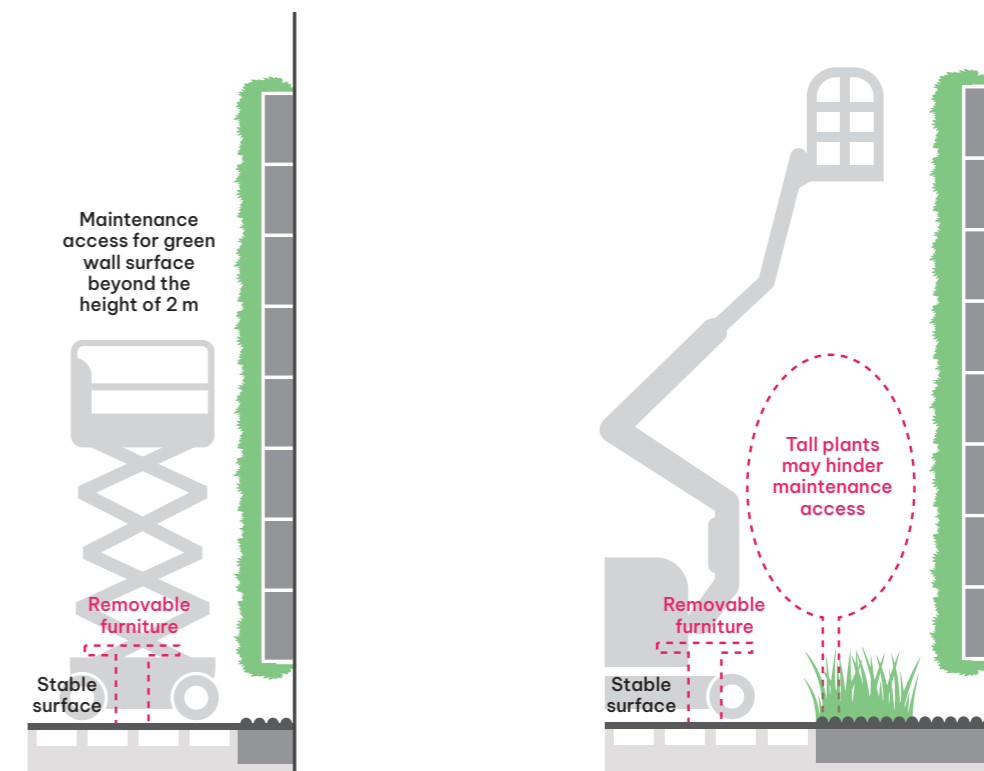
Examples of scissor lift and boom lift to maintain vertical greenery (Source: Façade Access Design Guide, Building and Construction Authority of Singapore, 2017)
